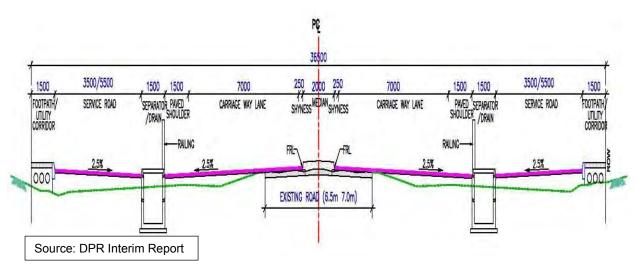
Typical Four Lane Road Cross Section in Urban Area
